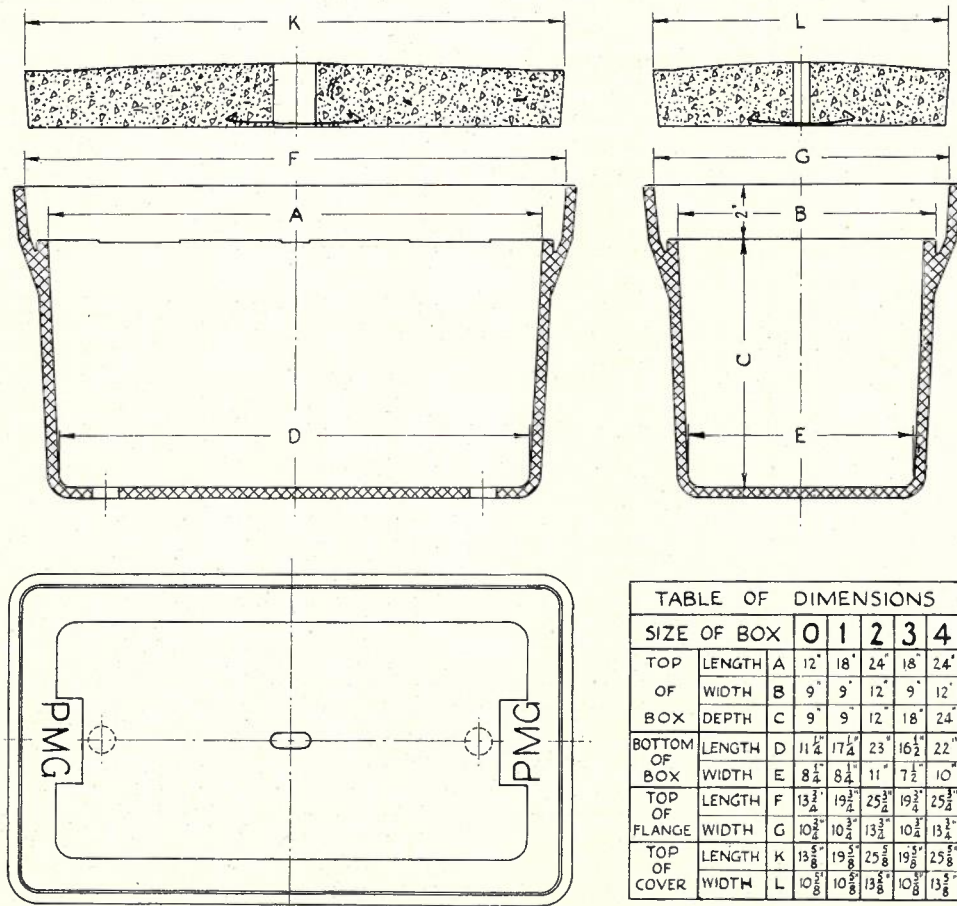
Precast Jointing Pits, Sizes Nos. 0-4.
